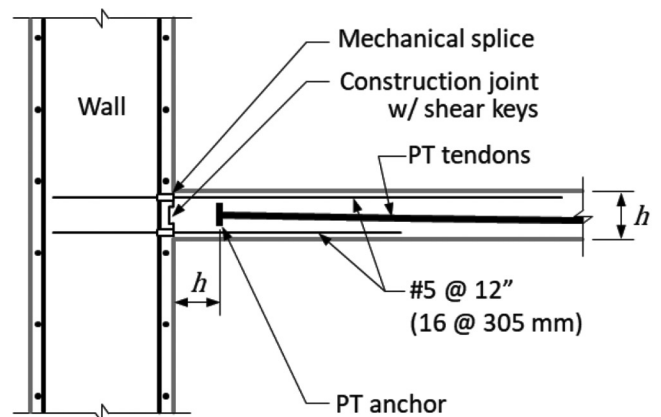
Test specimen detailing at slab-wall connection for Specimen 2.
